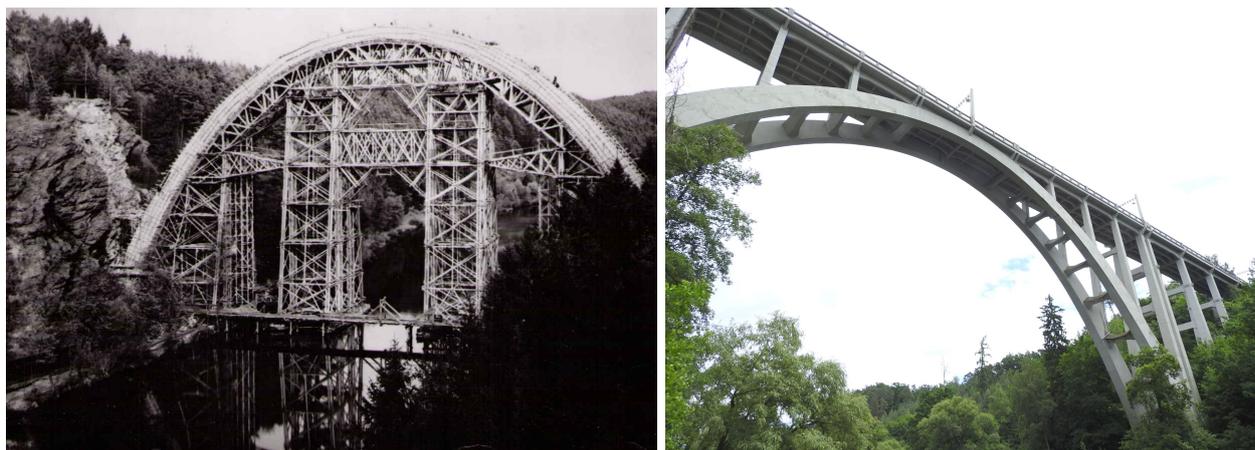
Arch road – railway bridge at Bechyně, 1928 (left – construction [6], right – at present).
